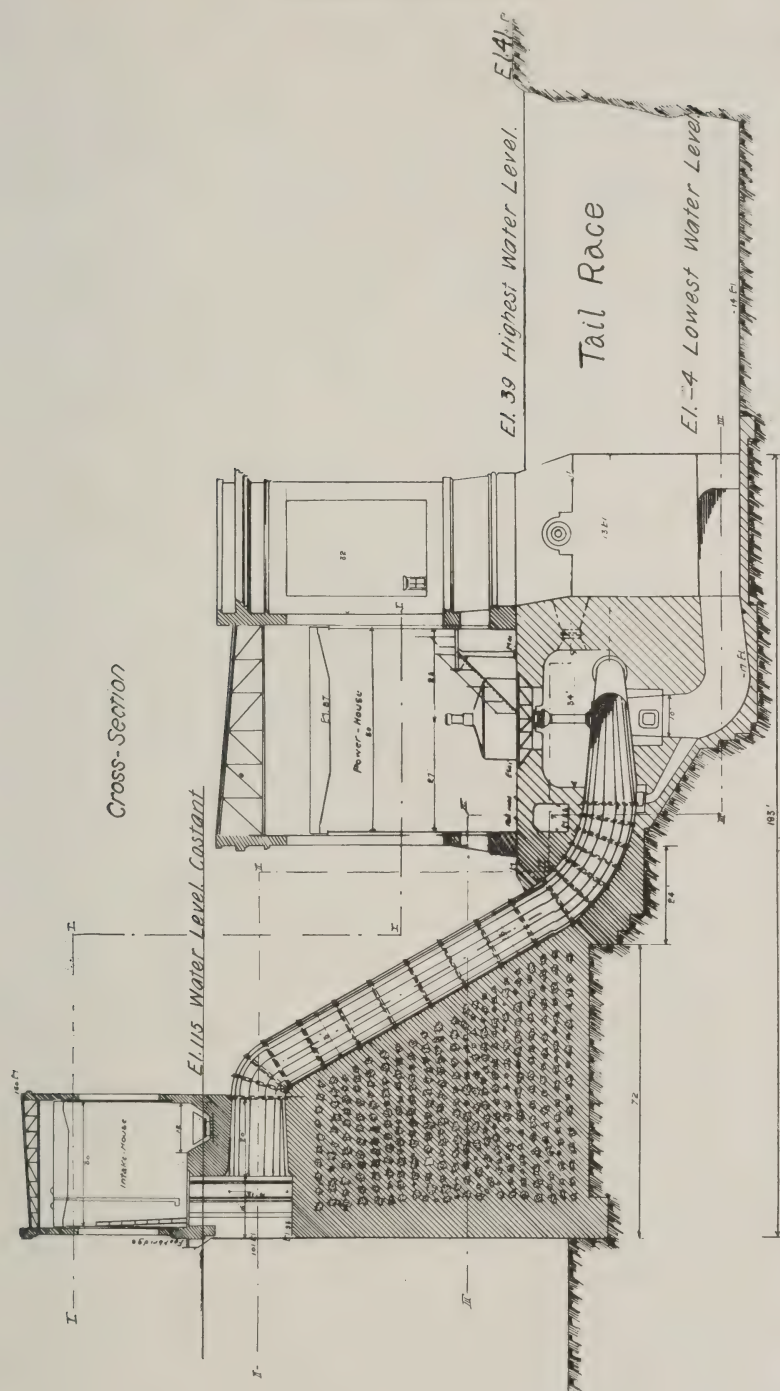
Section through dam and power-house along center line of draft tube, showing one of the nine turbines in complete plan.
